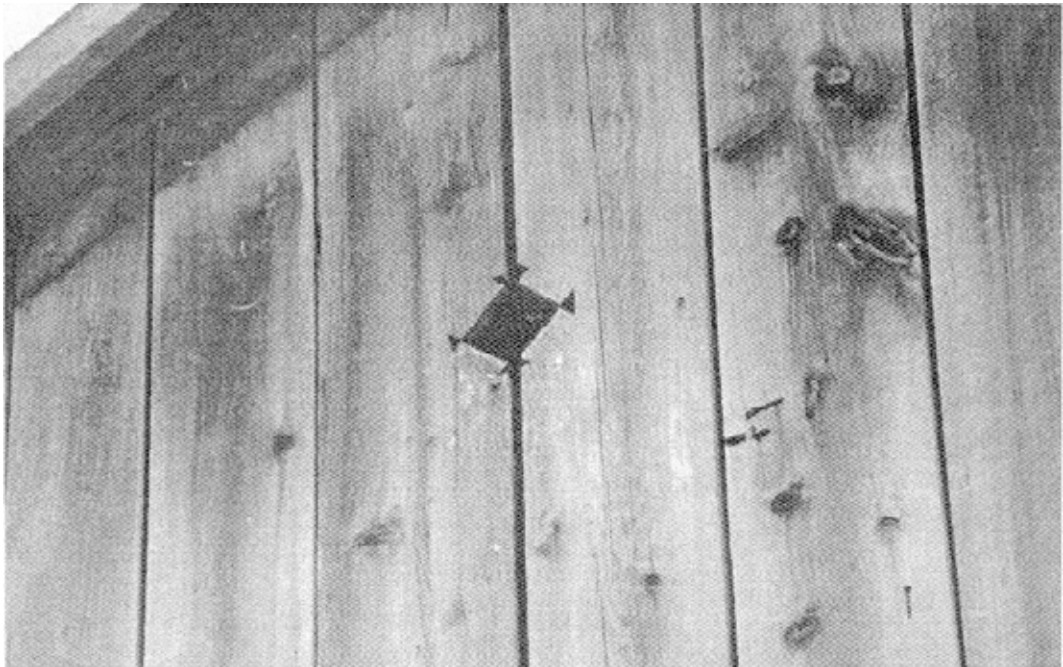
Detail of gable-end cutout on north wall of Schnor barn,
